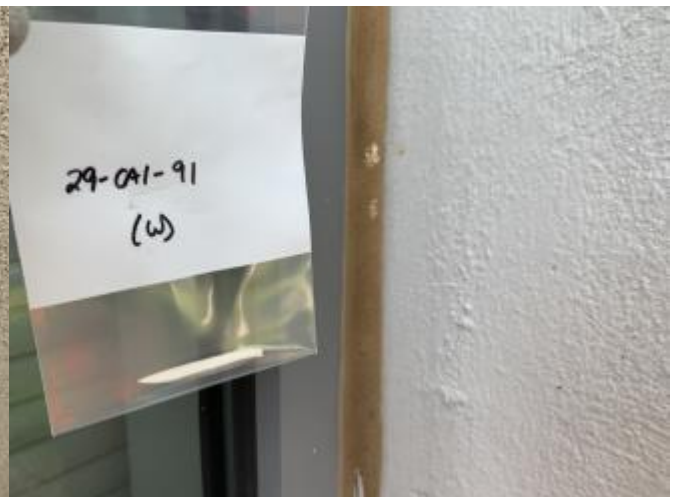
HA 29, ACM white window caulk located on the exterior lower level windows.
